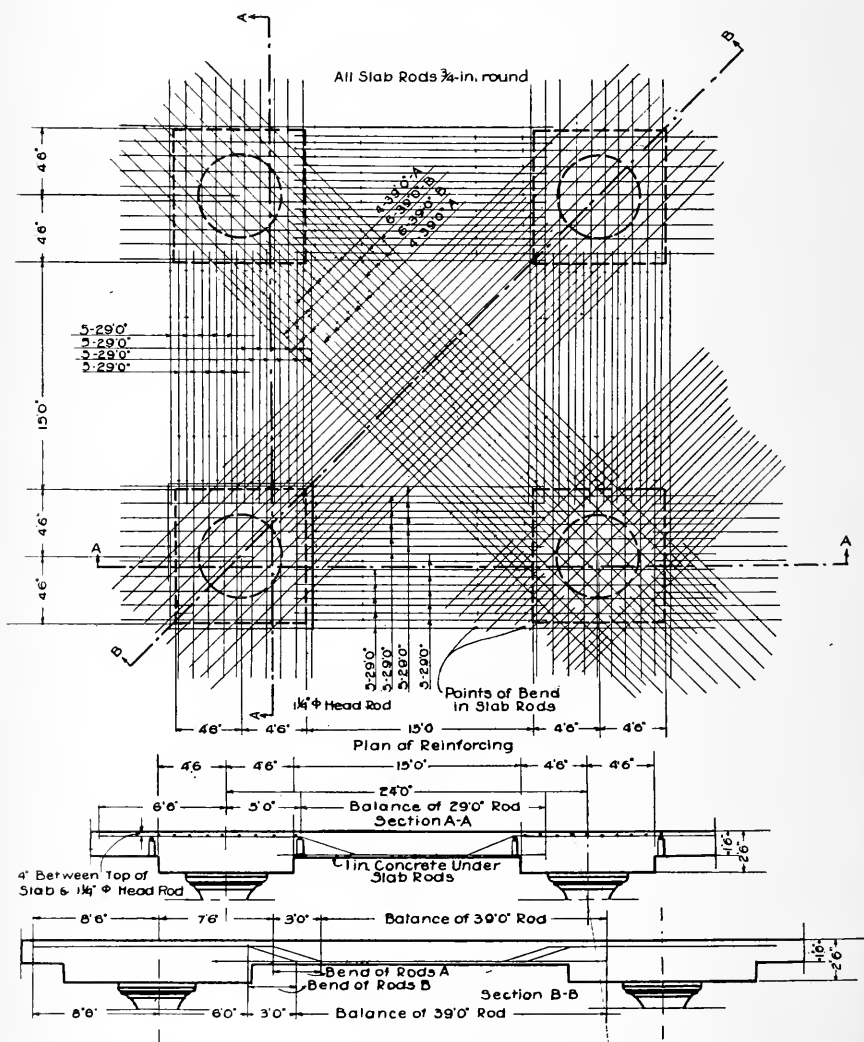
DIMENSIONS AND REINFORCEMENT OF TYPICAL PANEL OF SOO TERMINAL TEST FLOOR.
